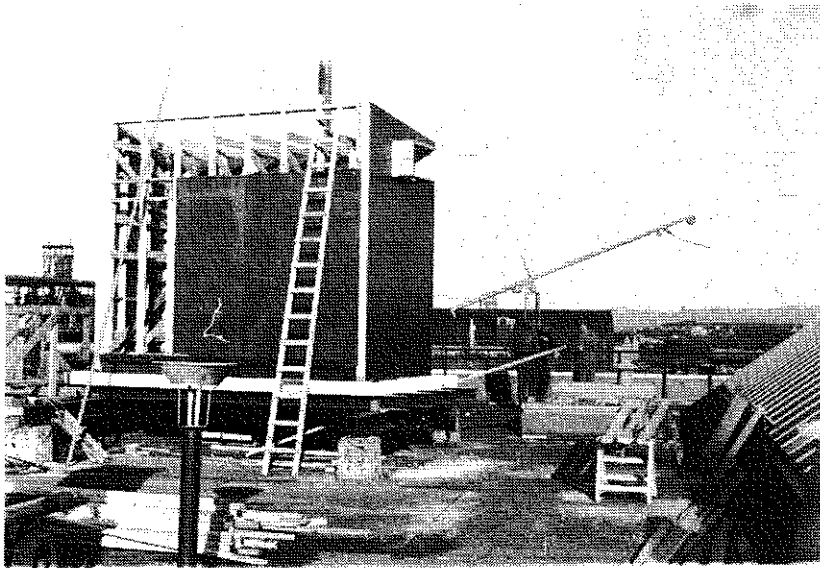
1969, February. Steel beams are placed on the top of the concrete supports and on a floor of aerated concrete the concrete forms of House I were built. No oil was used on the mould surfaces
